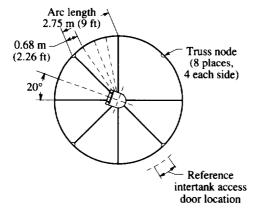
Third floor of lunar habitat. Floor outside diameter, 7 m (23 ft); Total floor area minus Area of access opening, 37.6 m<sup>2</sup> (405 ft<sup>2</sup>).
